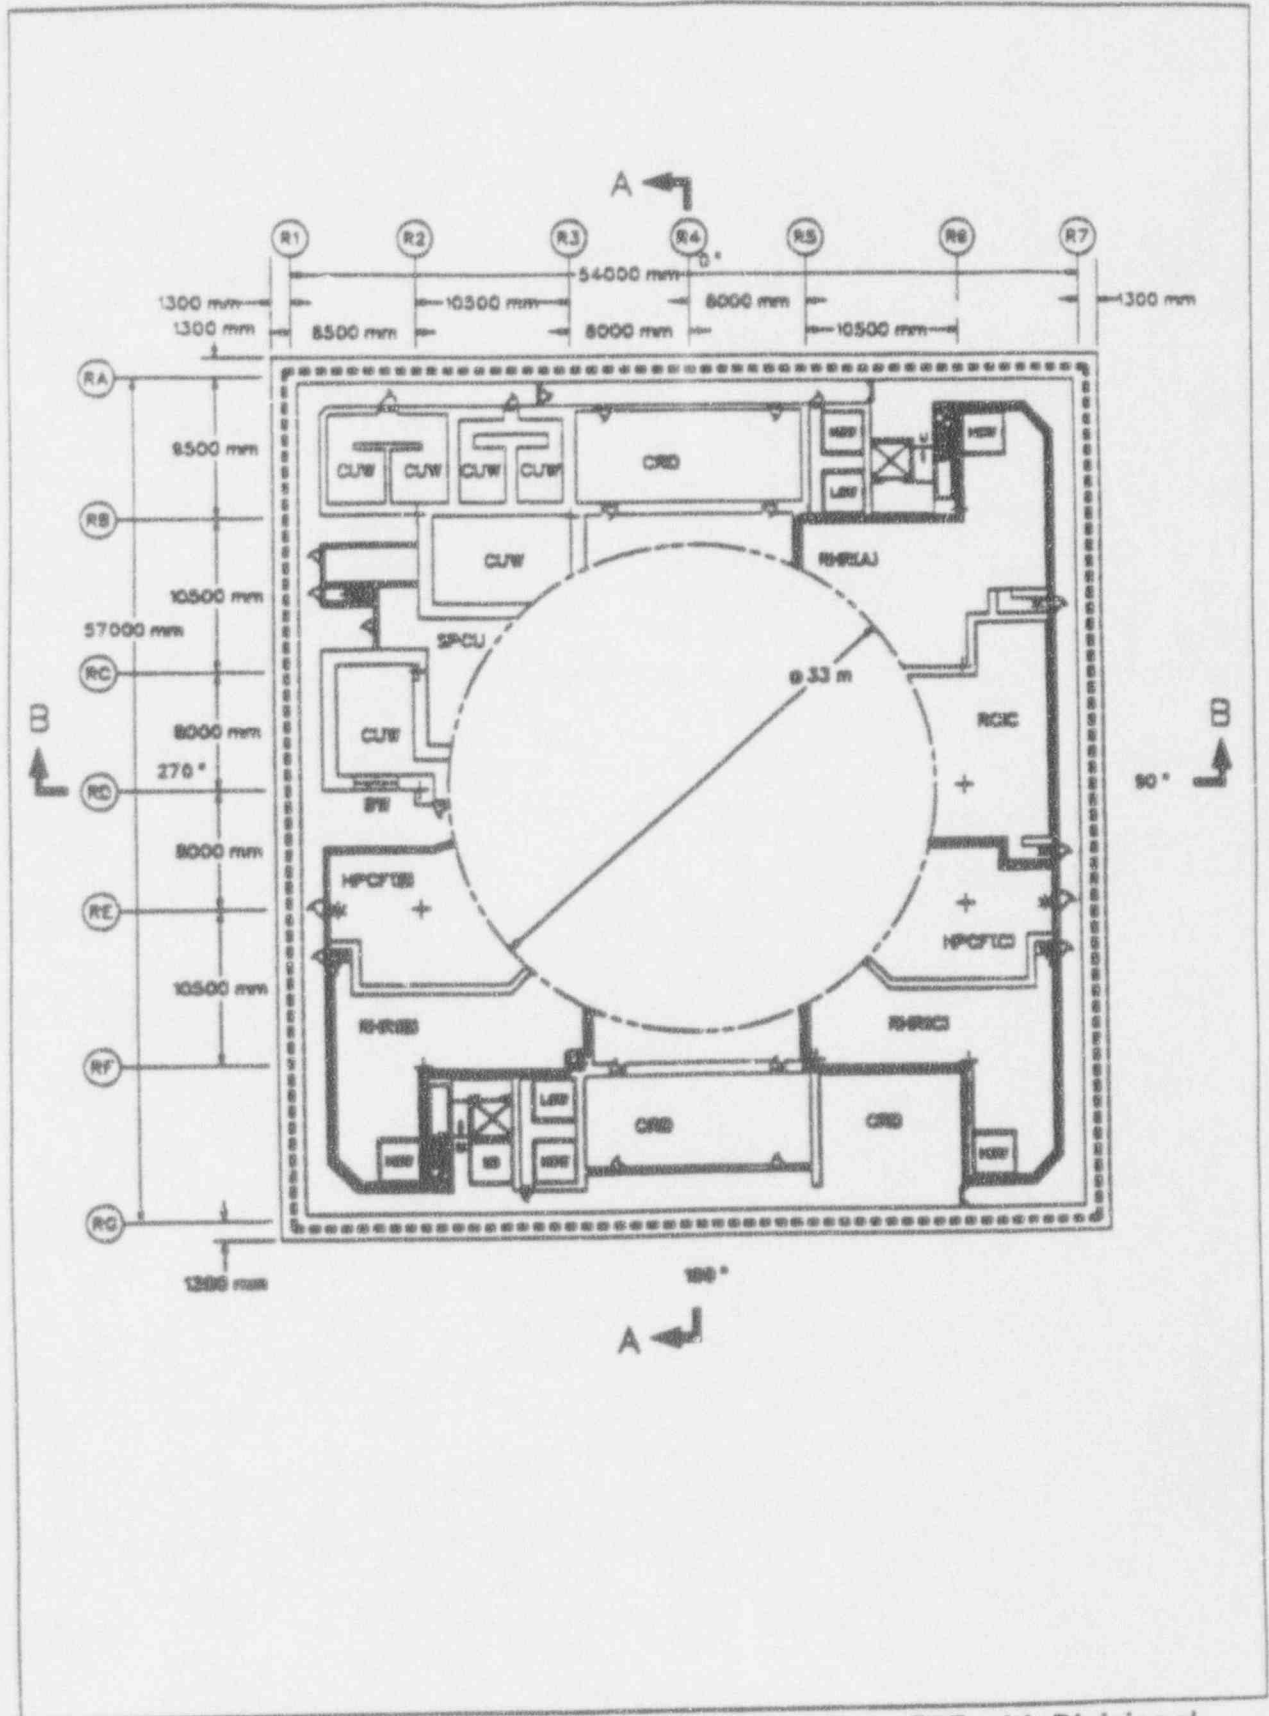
Reactor Building Arrangement, Floor B3F with Divisional Boundary for Flood—Elevation -8200 mm
